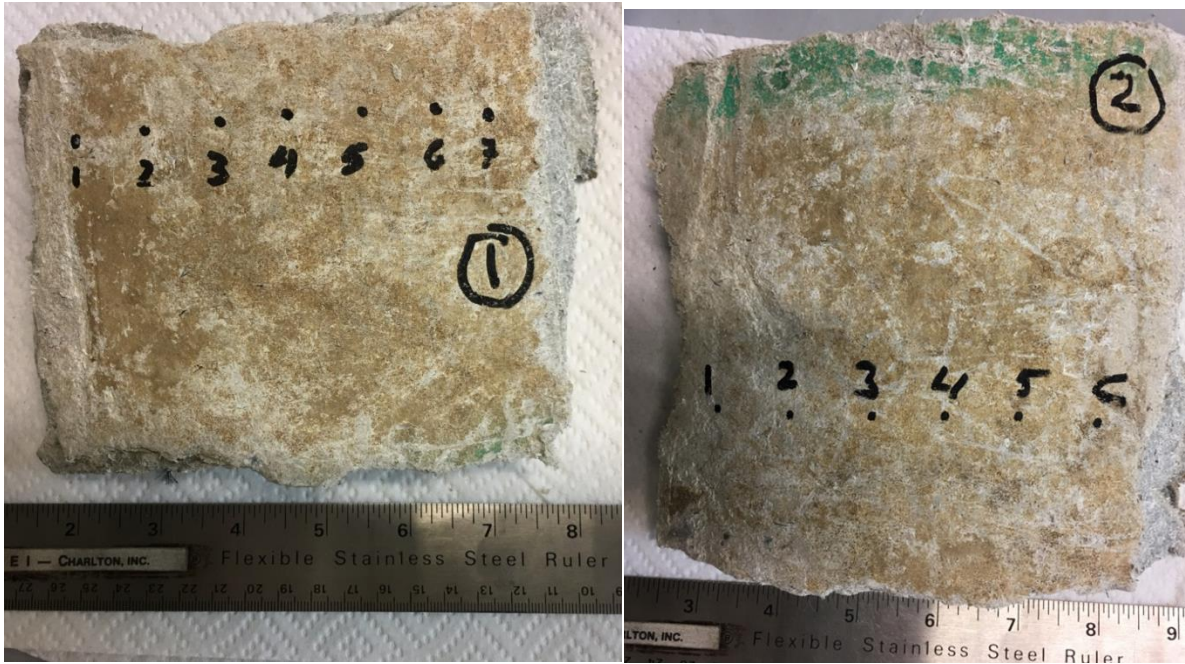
Outside view of the pipe section wall of Sample 1 (left) and Sample 2 (right)
